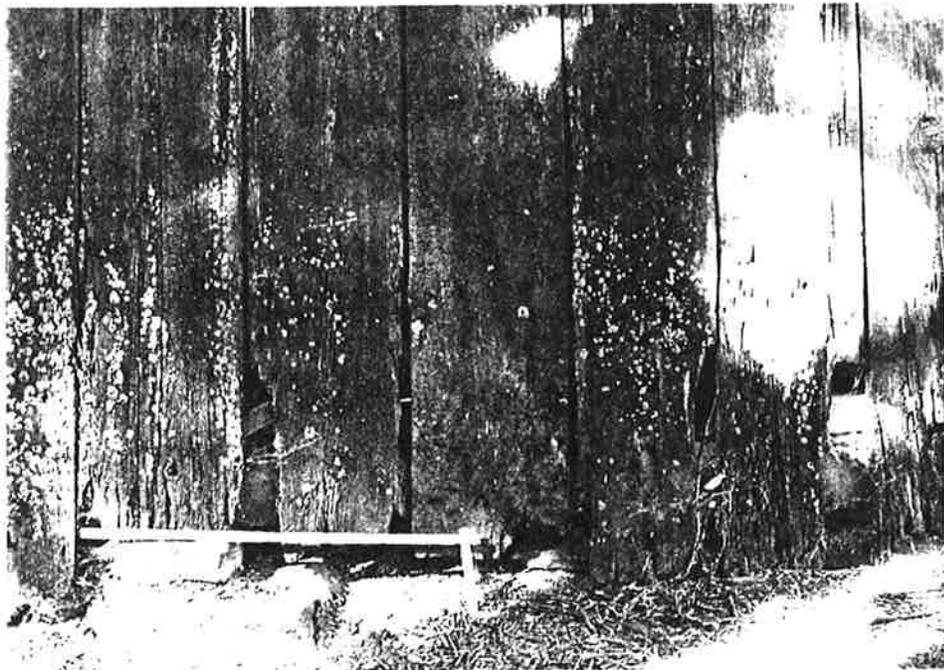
Morrison garage/shop, south wall moisture damage. (Neg. R1-15)
